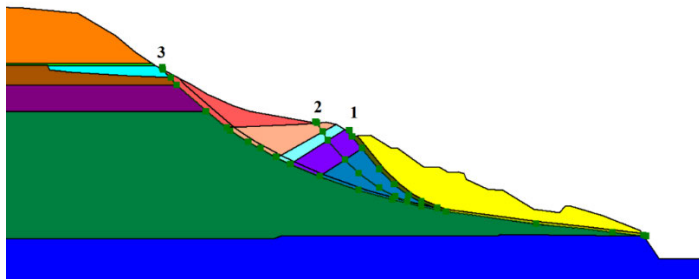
Fully specified, non-circular surfaces of rupture.
